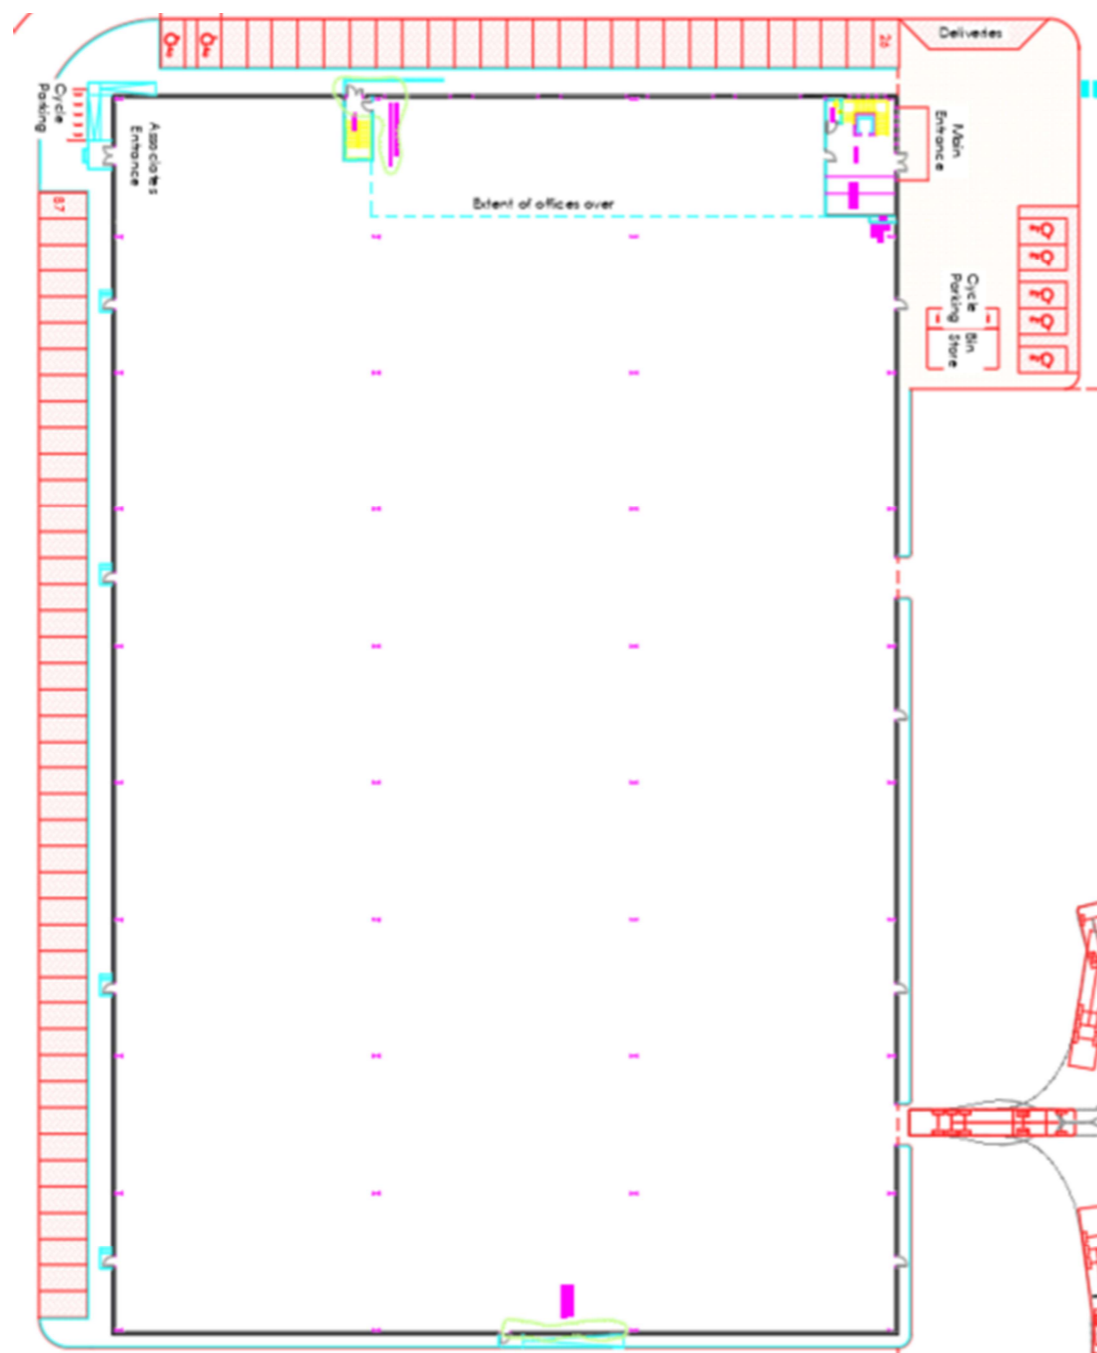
Site Plan (Arctech Partnership LLP: 8514-XX-XX-DR-A-120)
